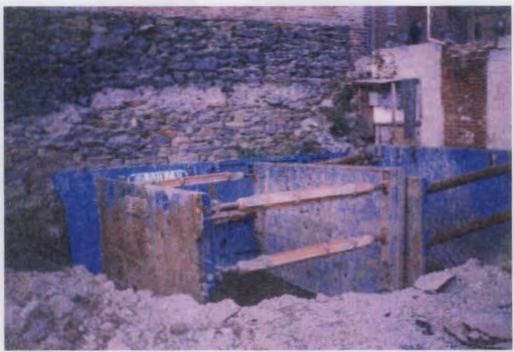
Excavation of the southwest corner of the site along the Orchard Mews building
